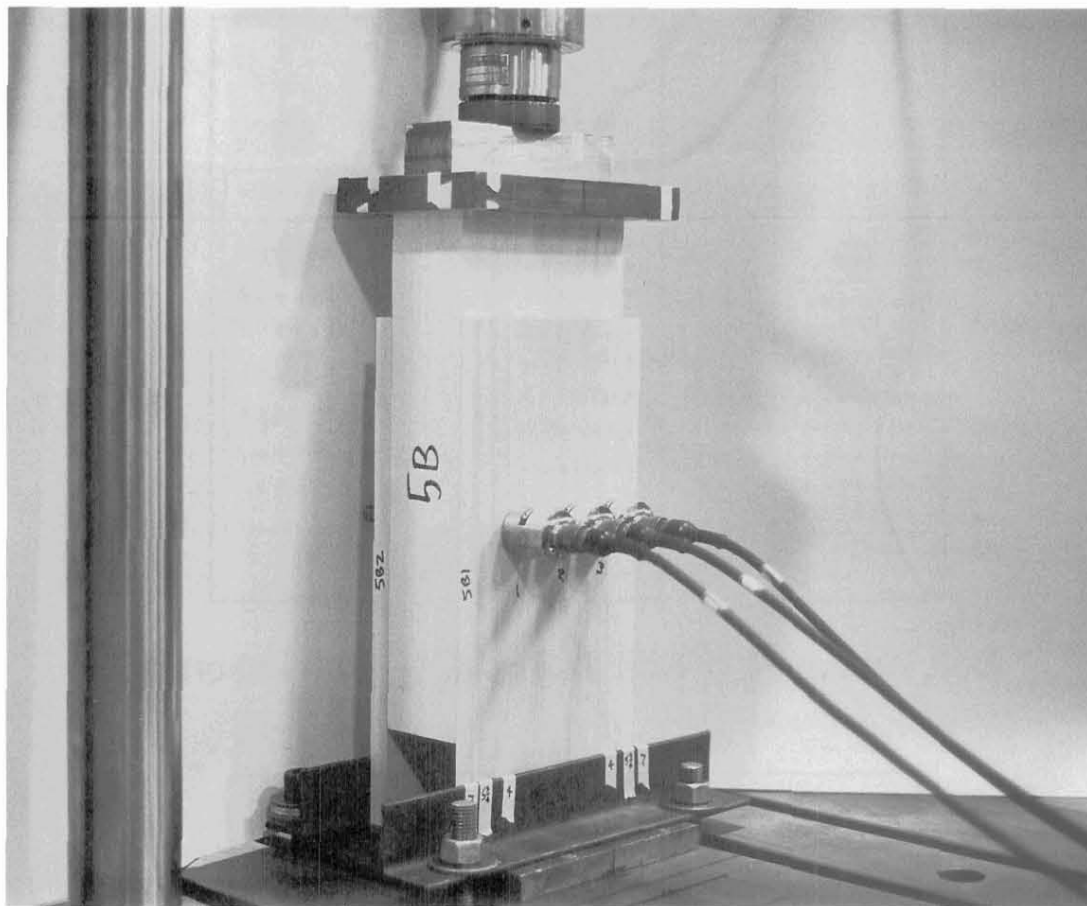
Photograph of a three-member wood connection showing testing machine, loading setup, and test specimen configuration.
